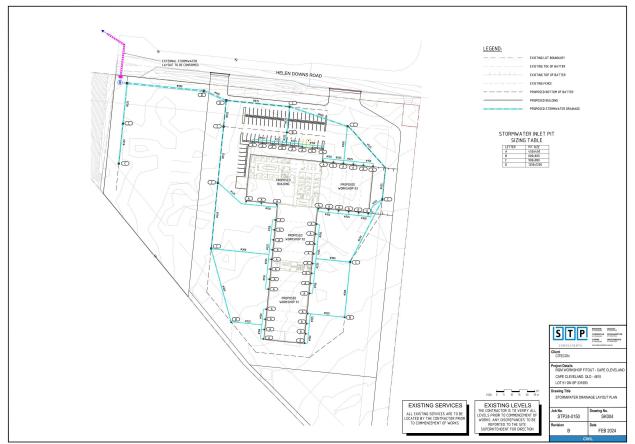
Preliminary civil works layout (refer Appendix A)
